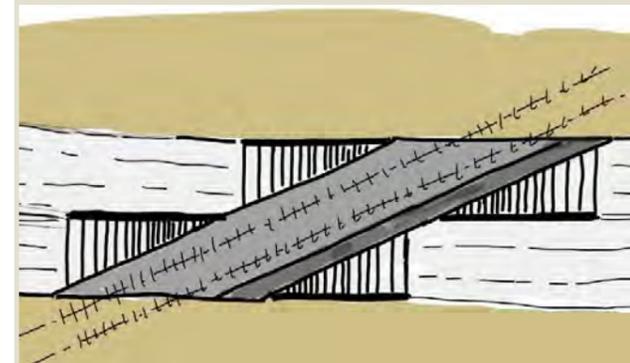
Plan view of a railway and highway crossing with a strong skew
